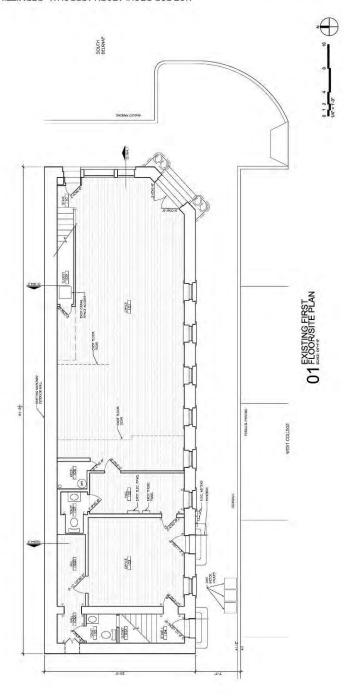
Existing First Floor/ Site Plan (prior to 2014-2015 rehabilitation)
